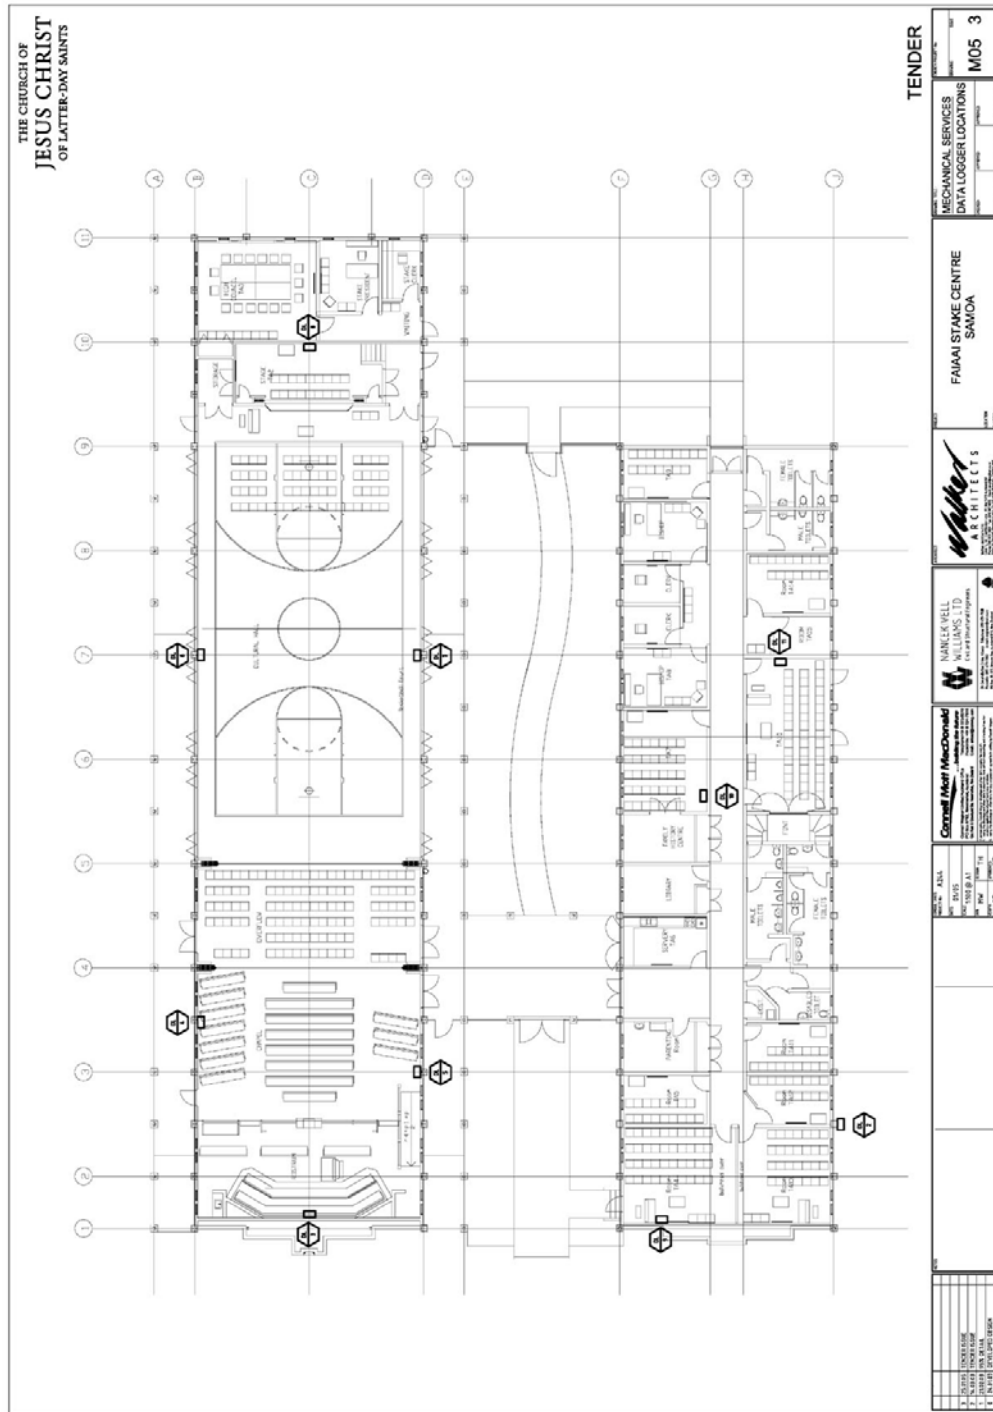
Floor plan of Faiaii Meeting House showing data logger locations
